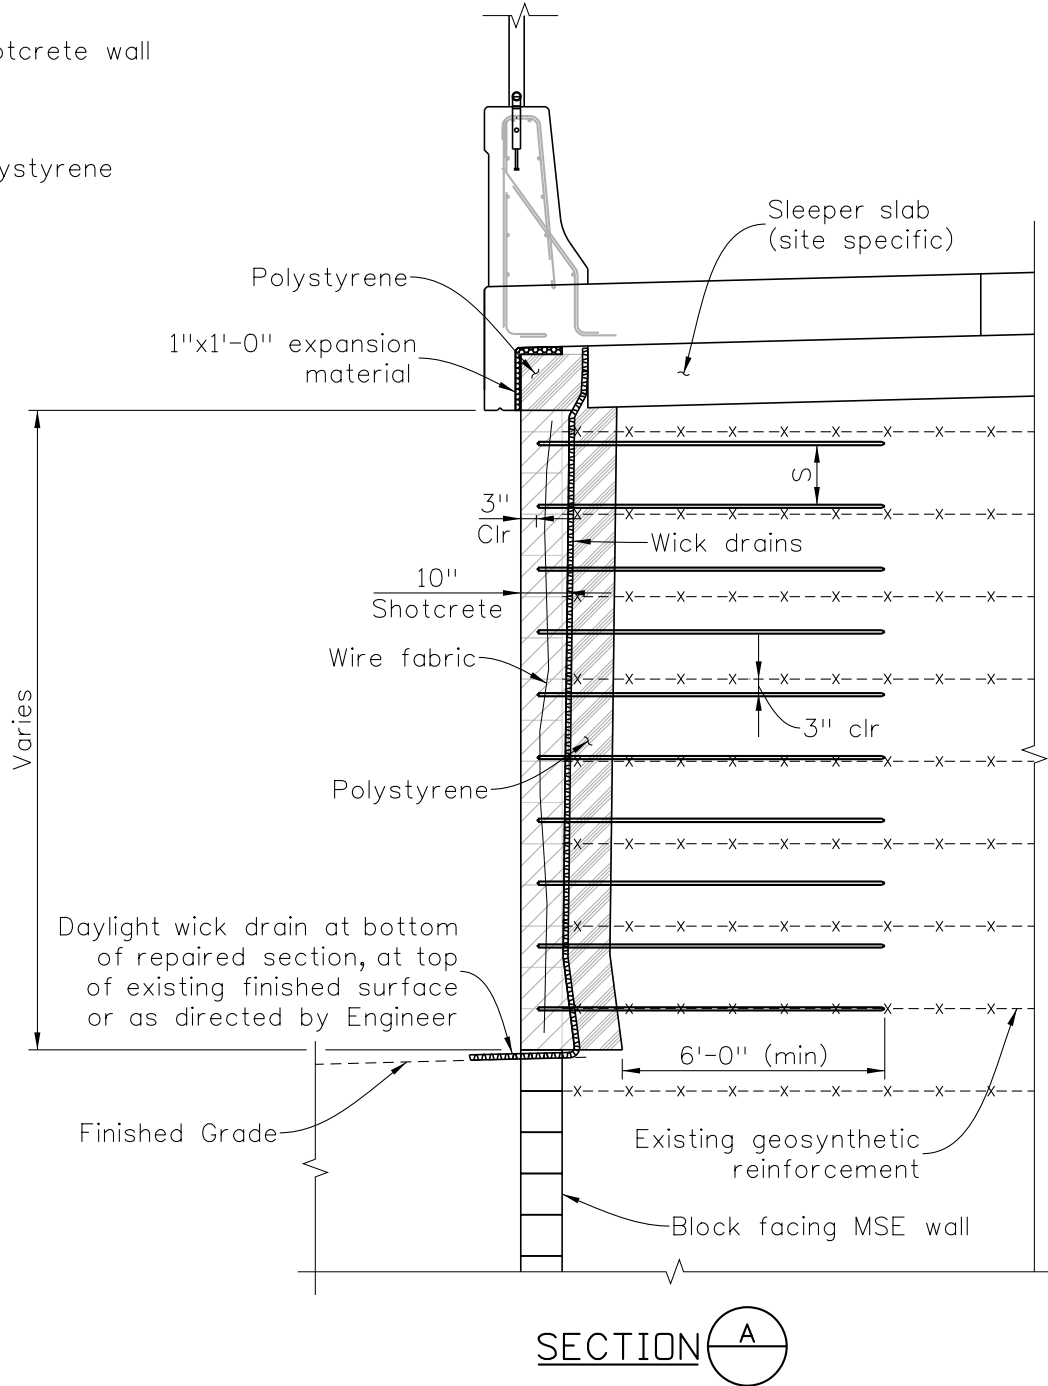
(J)-3 Sample Section for block MSE Repair
